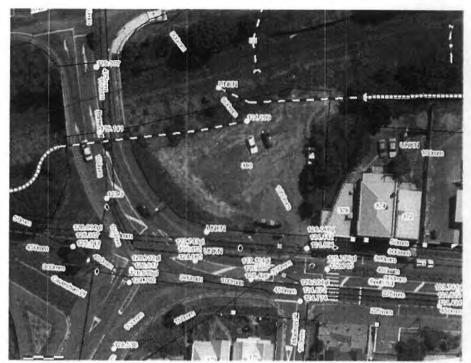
Piped and open drainage pathways in and adjacent to the site locale (Source DCC Water Services).
